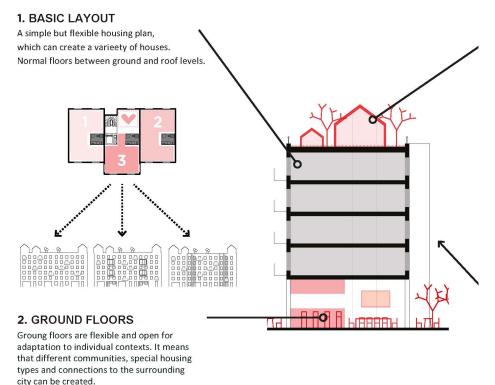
BOFA - Basics of apartments, floors, and blocks (Source: Domea, 2016).
